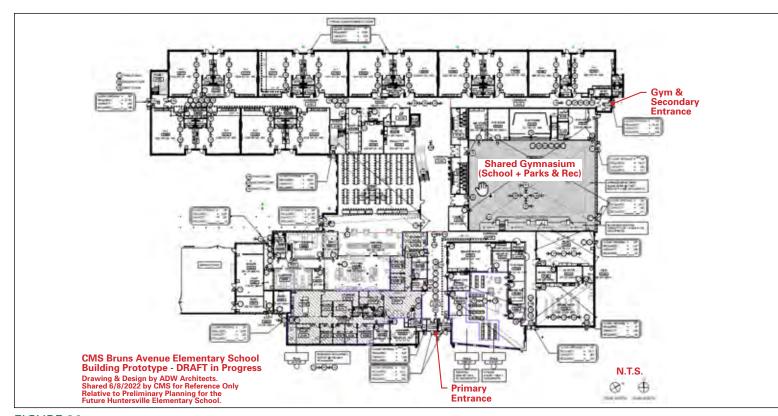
CMS Bruns Avenue Elementary School. ADW Architects.
